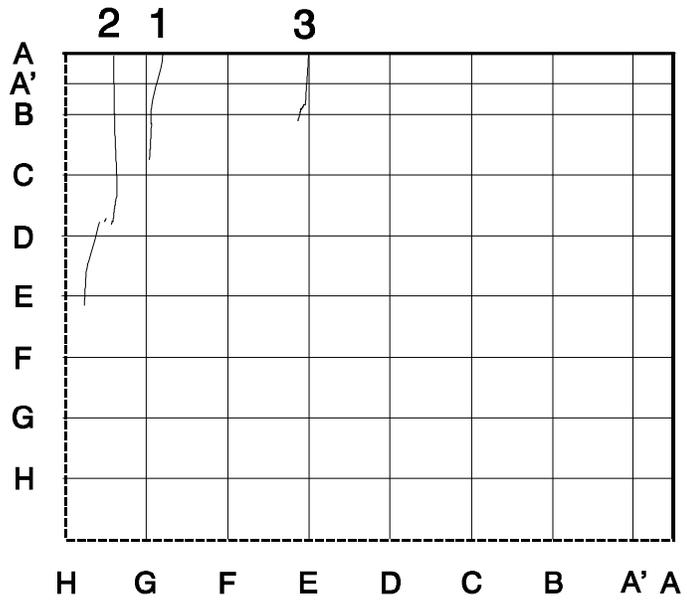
POJ-PU-54-TH cracking pattern on south face of joint at dead load
